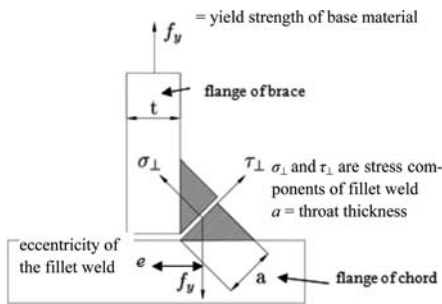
Equilibrium of stresses on fillet weld calculation cross-section.
